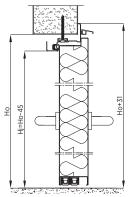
Installation of a single-leaf door to a steel structure – corner frame with a thermal break – horizontal cross-section
